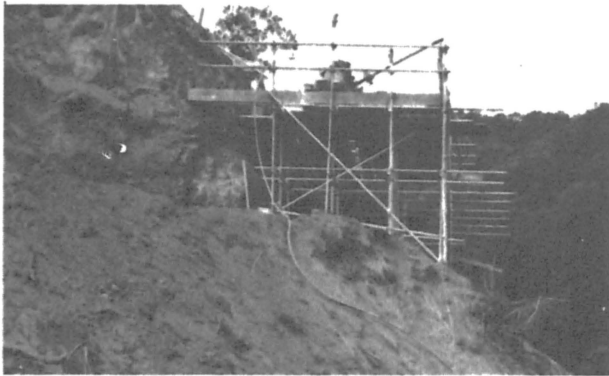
Construction of the Reinforced Slope Cutting in Progress
